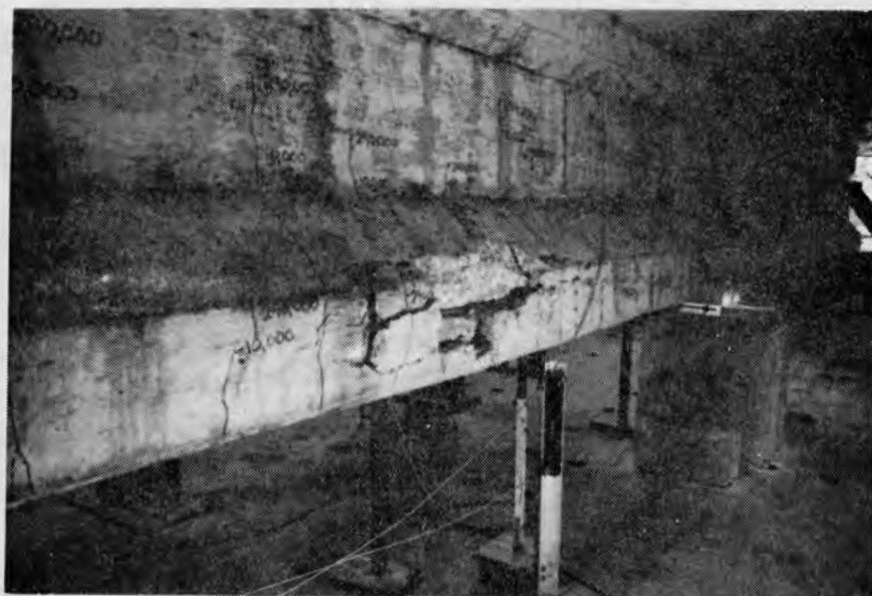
Concrete spalling after 1.20 million cycles
